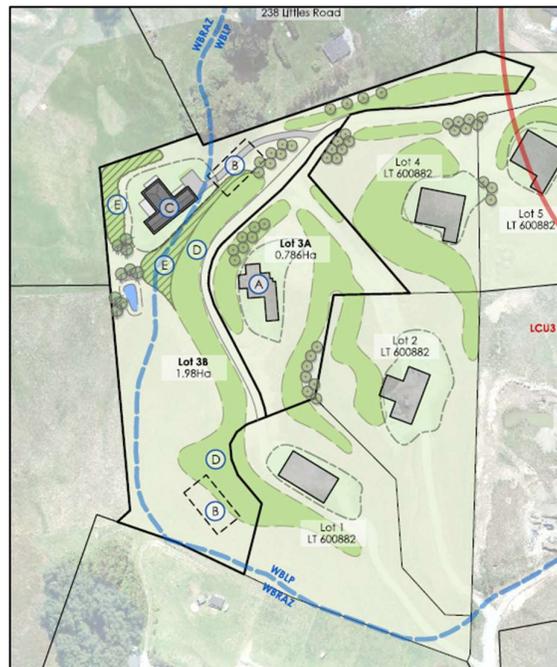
Snip of proposed structural landscape plan. Note, the dashed platforms marked as B were considered as alternative locations. Platform C shows the actual proposed location.
